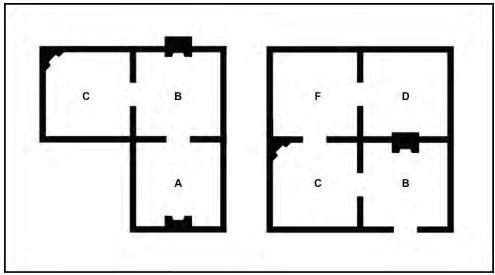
Second Possibile Floor Plain. Another possible starting point for the Finley House, or an expansion, would be a modified version of a three-room plan (on left), with the room with the angled stack ("C") joining A and B as a one-room ell. Although the archaeological evidence is inconclusive, another possibility (on right) is that an additional room flanked C (on the northeast) and room "A" with its large (likely for cooking) stack was not connected to the house, but rooms B and D were.
